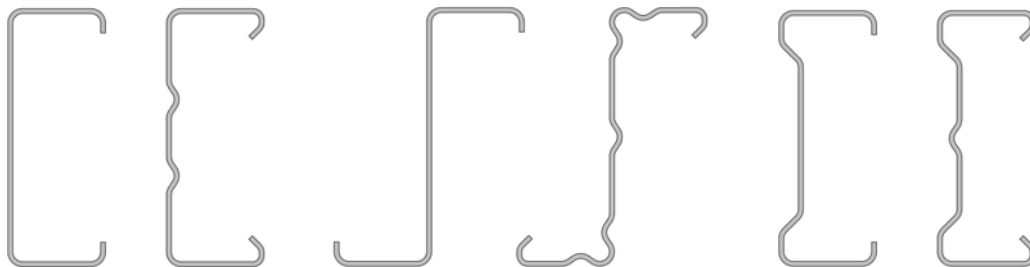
Cold-formed steel C, Z and Σ cross-sections with or without stiffeners
